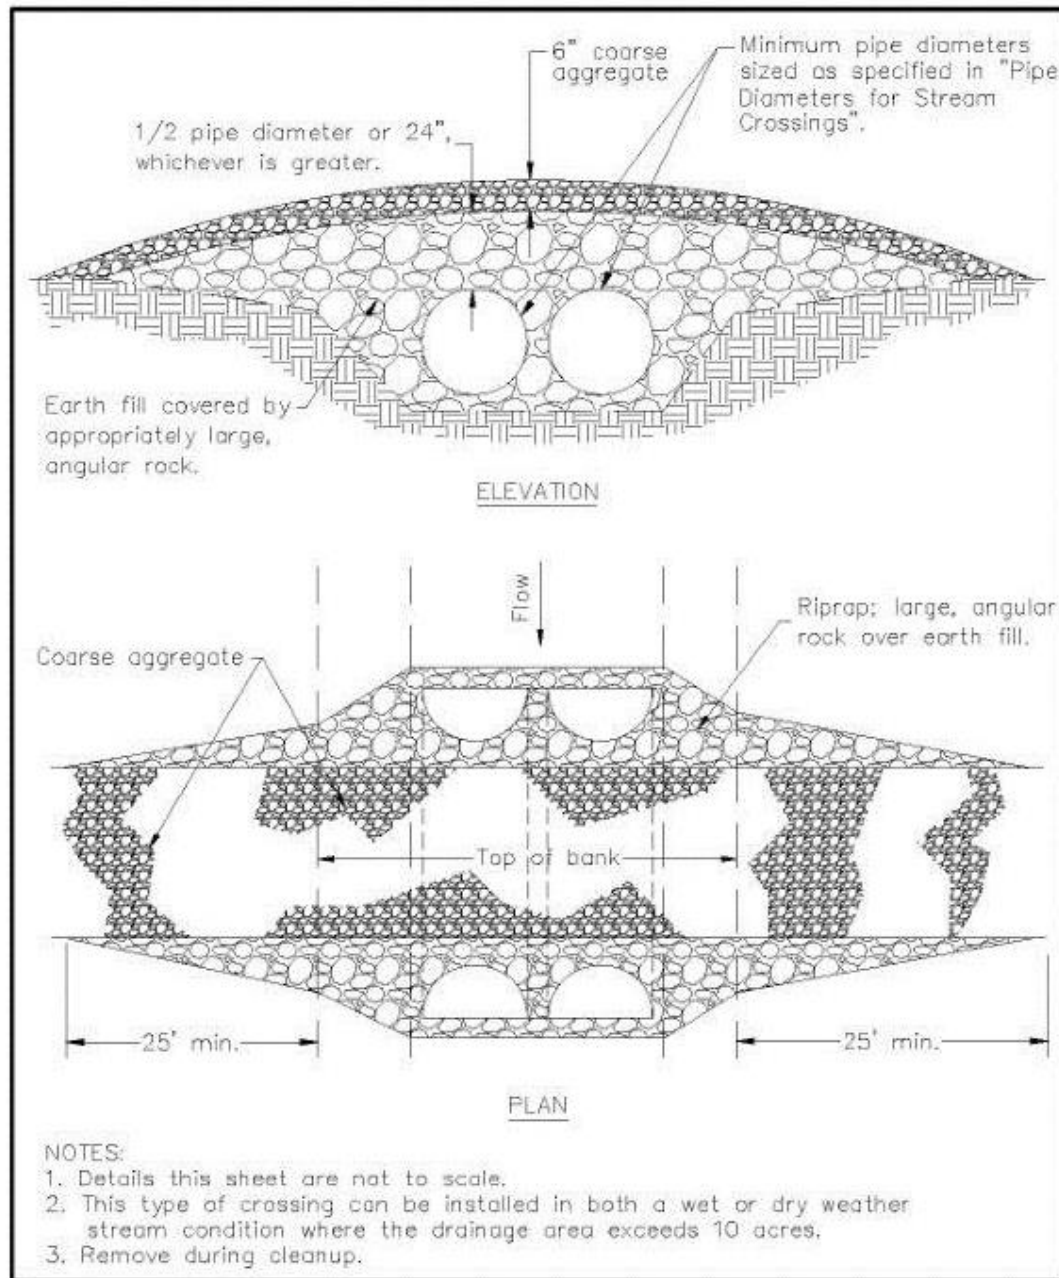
Typical Temporary Culvert Stream Crossing
